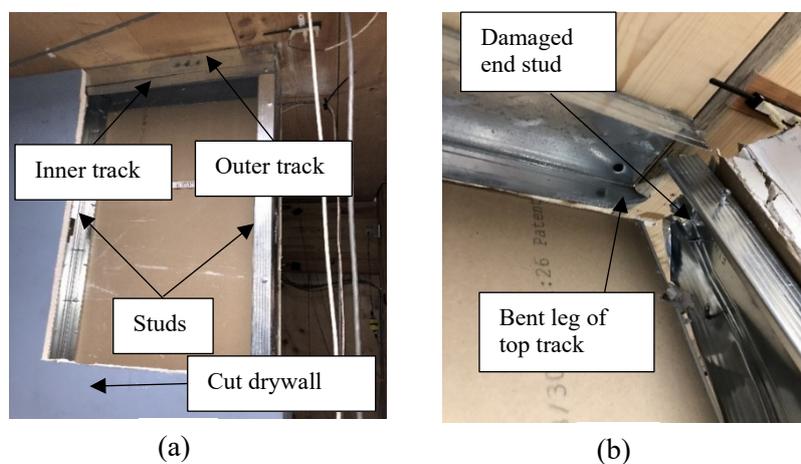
Phase 1 post-test inspection after removal of drywall: (a) damage in the wall with telescoping detailing; (b) damage in the wall with a slip track connection
